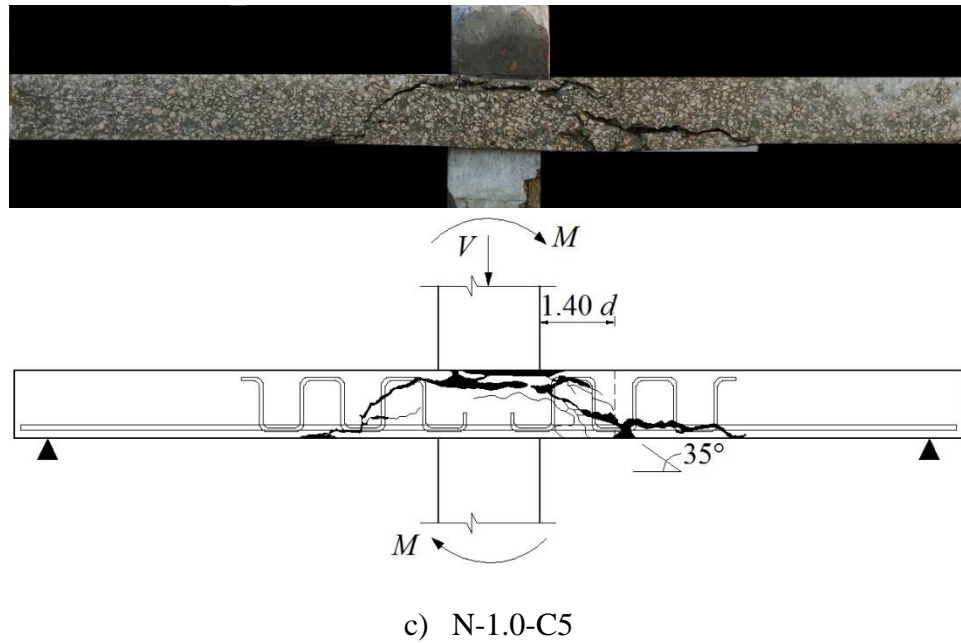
Cross-section and schematic drawing of internal cracks (Series 2) - continued
